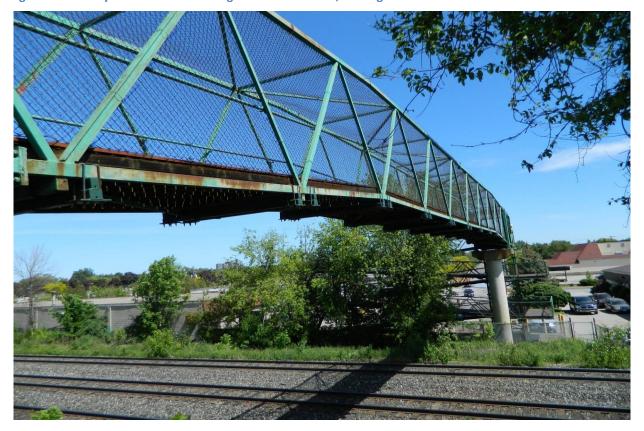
Drury Lane Pedestrian Bridge - West Elevation, looking South
